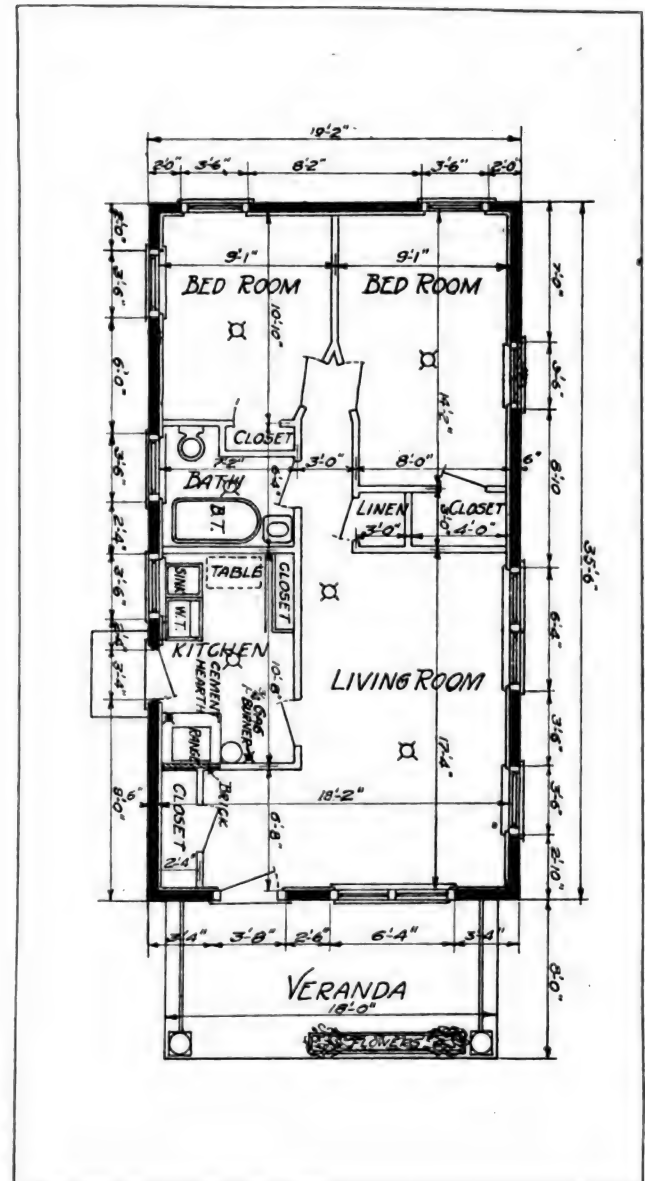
FLOOR PLAN OF SECOND GROUP OF 32 COTTAGES NOW UNDER CONSTRUCTION
